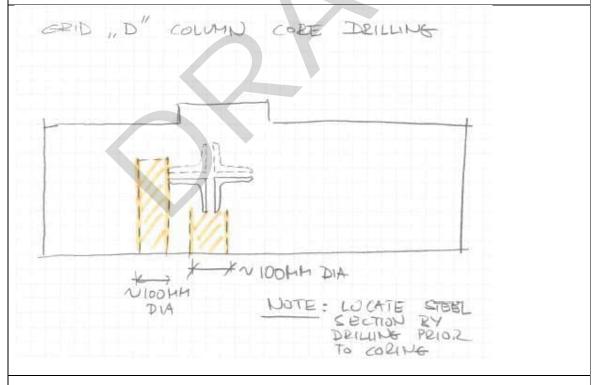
Core drilling to one of the columns on gridline D5 to D8, level 0
